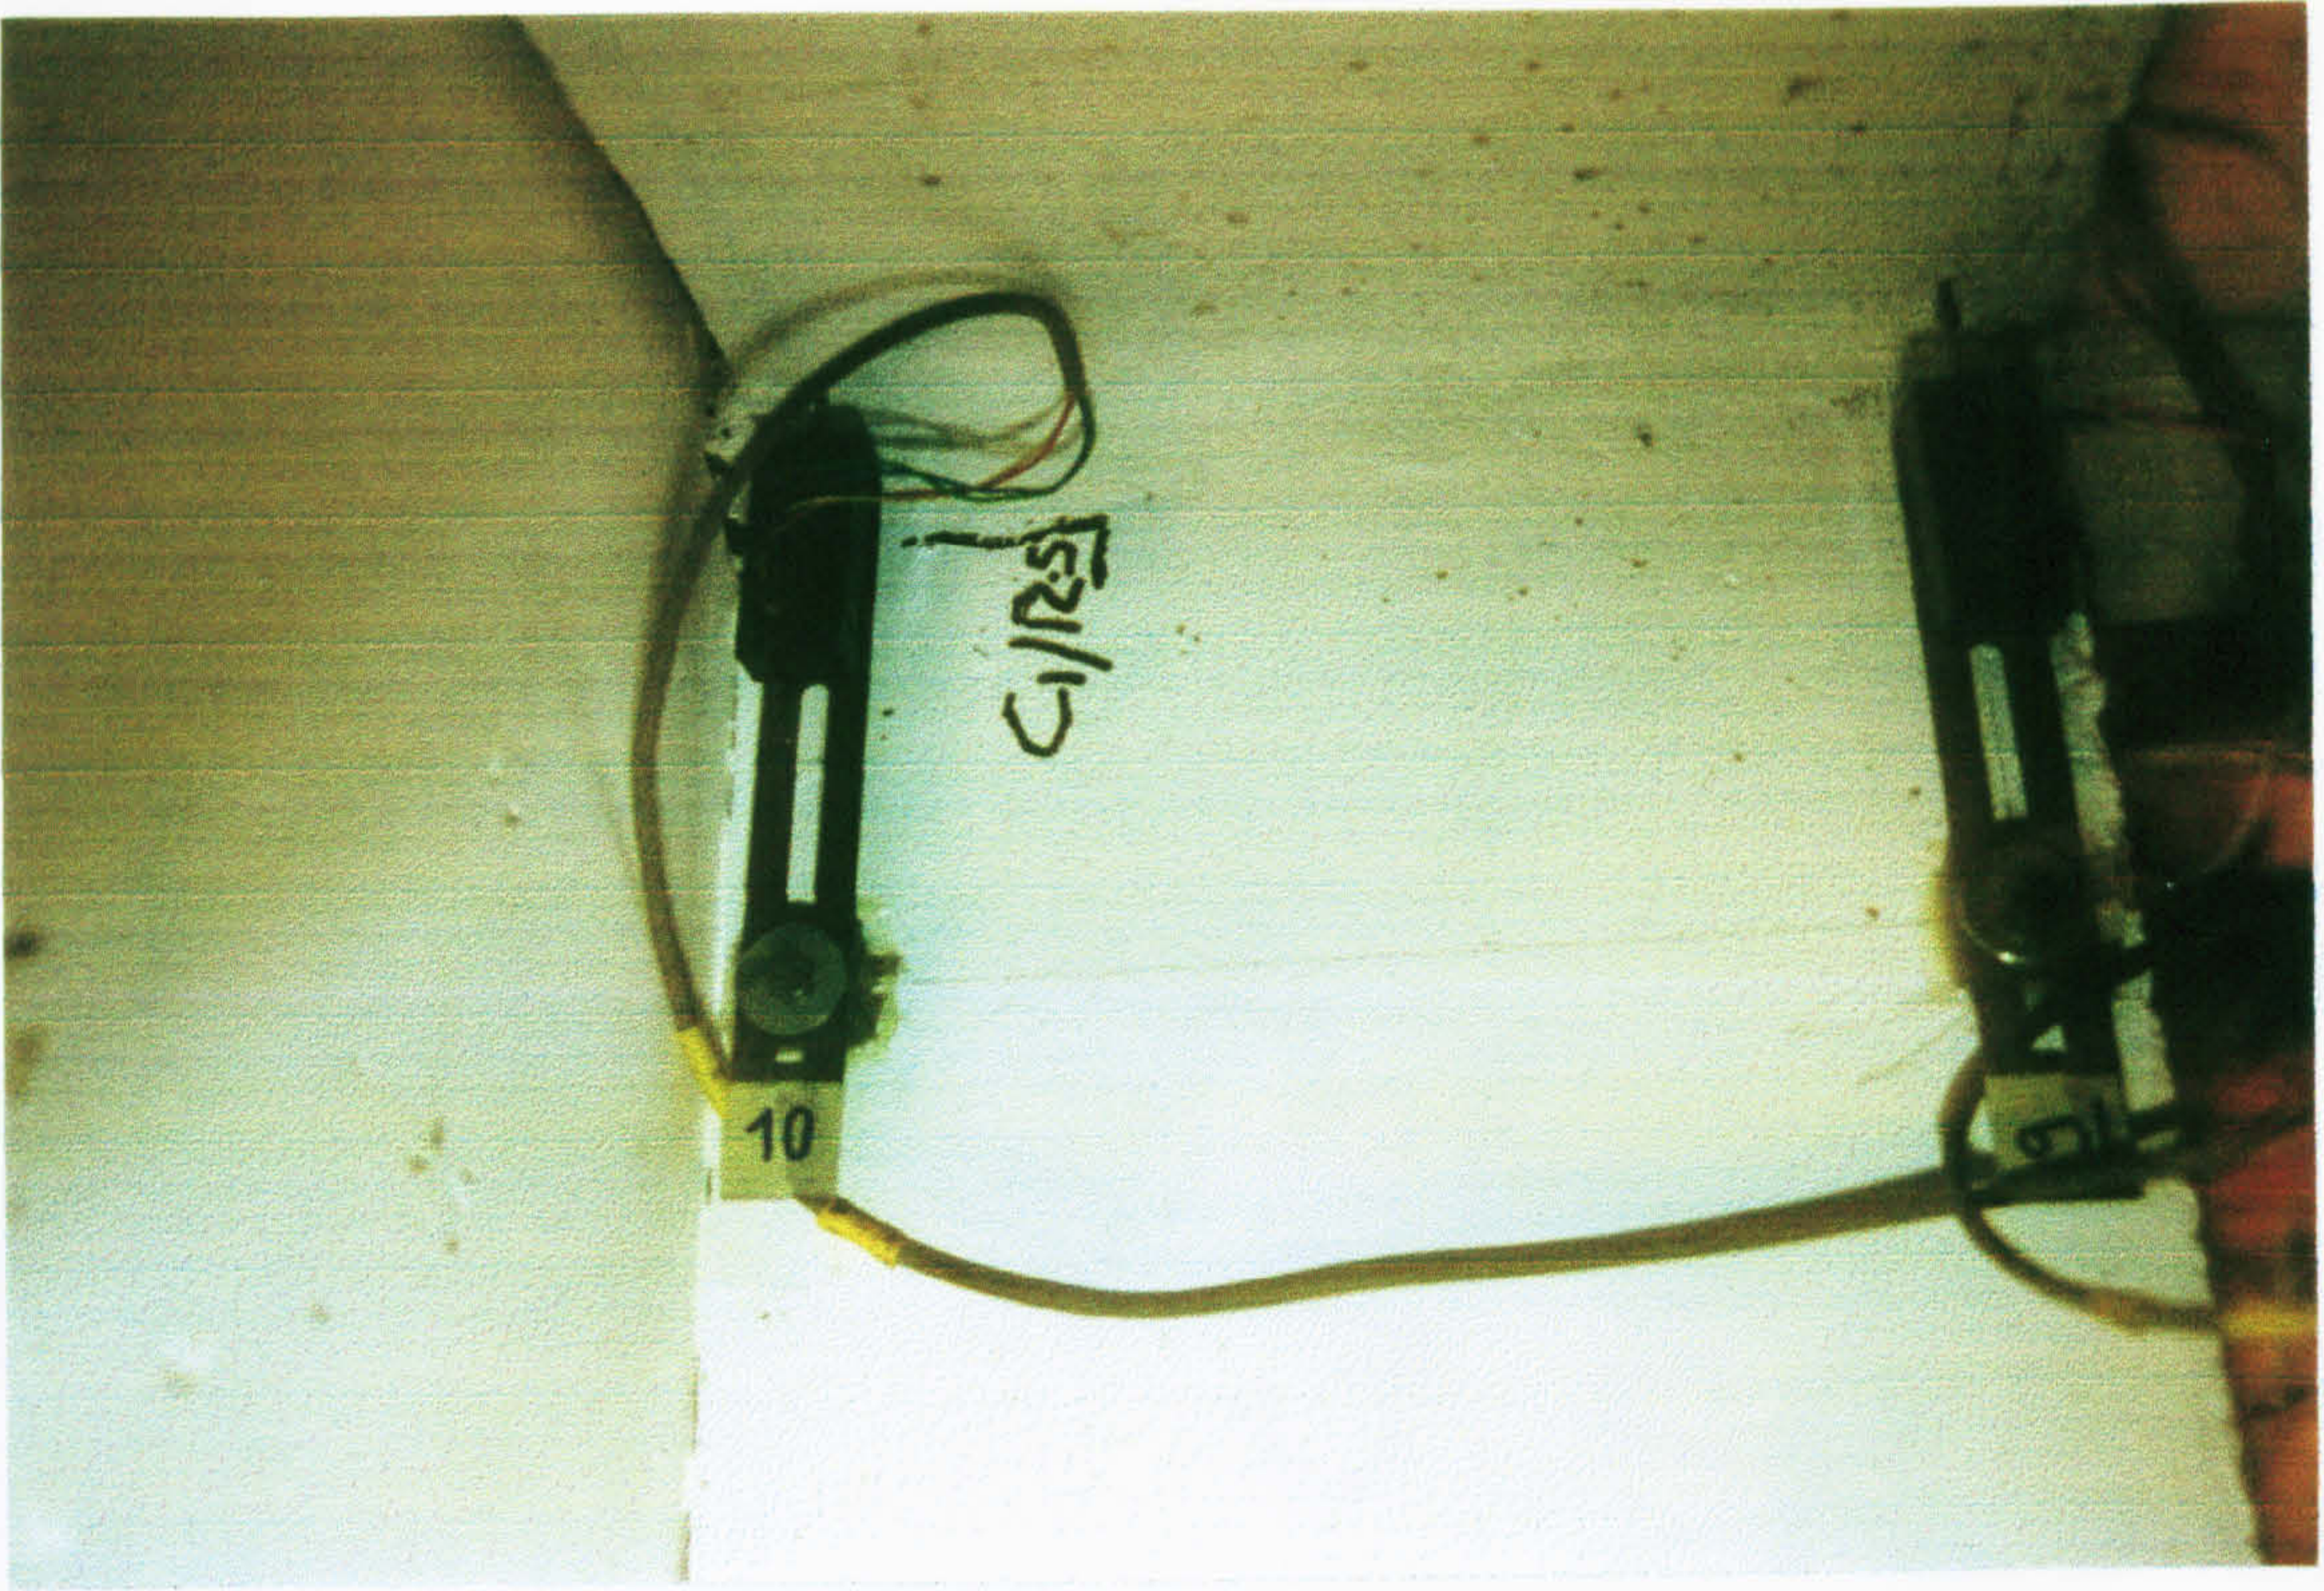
First cracks opening at joint-column boundary from East and West in TB2
